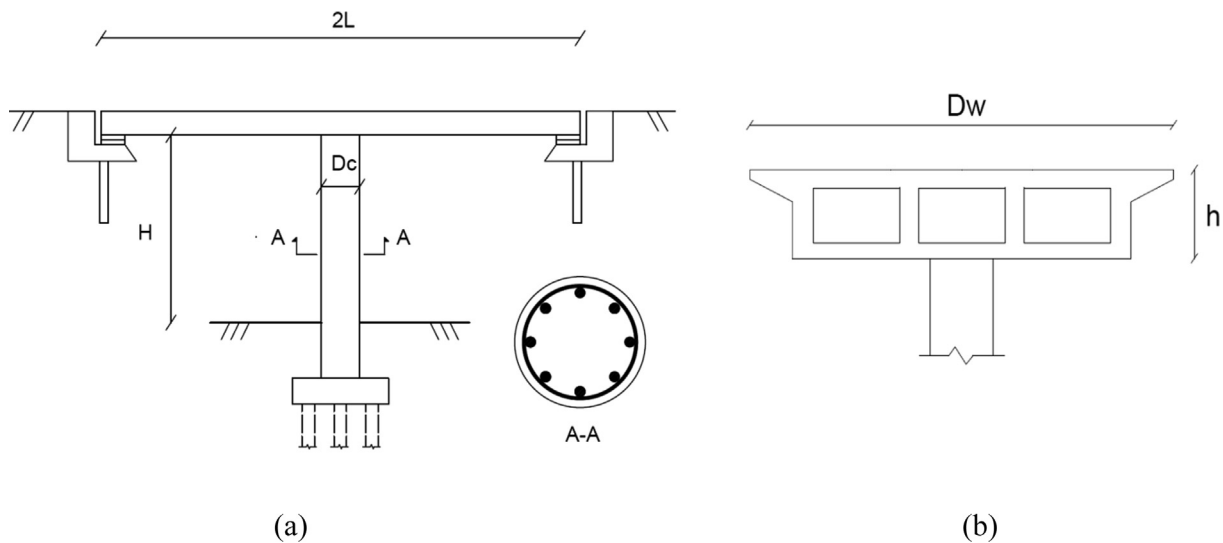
(a) Longitudinal view and (b) transverse view of sample bridge.
